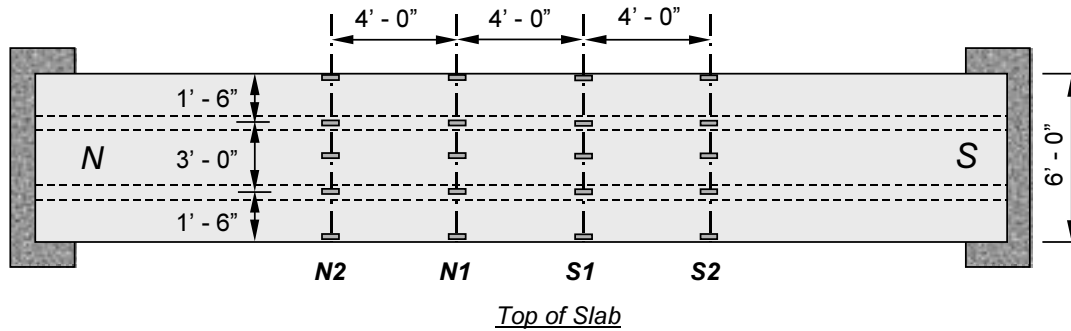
Position of Instrumented Sections for Pan-Girder Specimens
